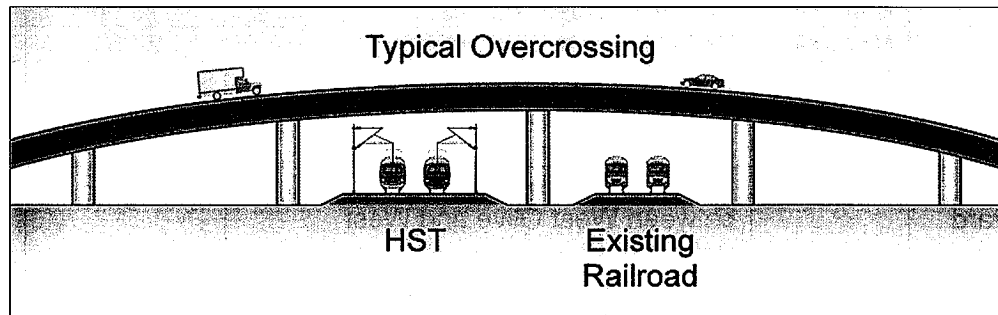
Typical Cross section of a Roadway Overcrossing for both the HST and an Existing Railroad
